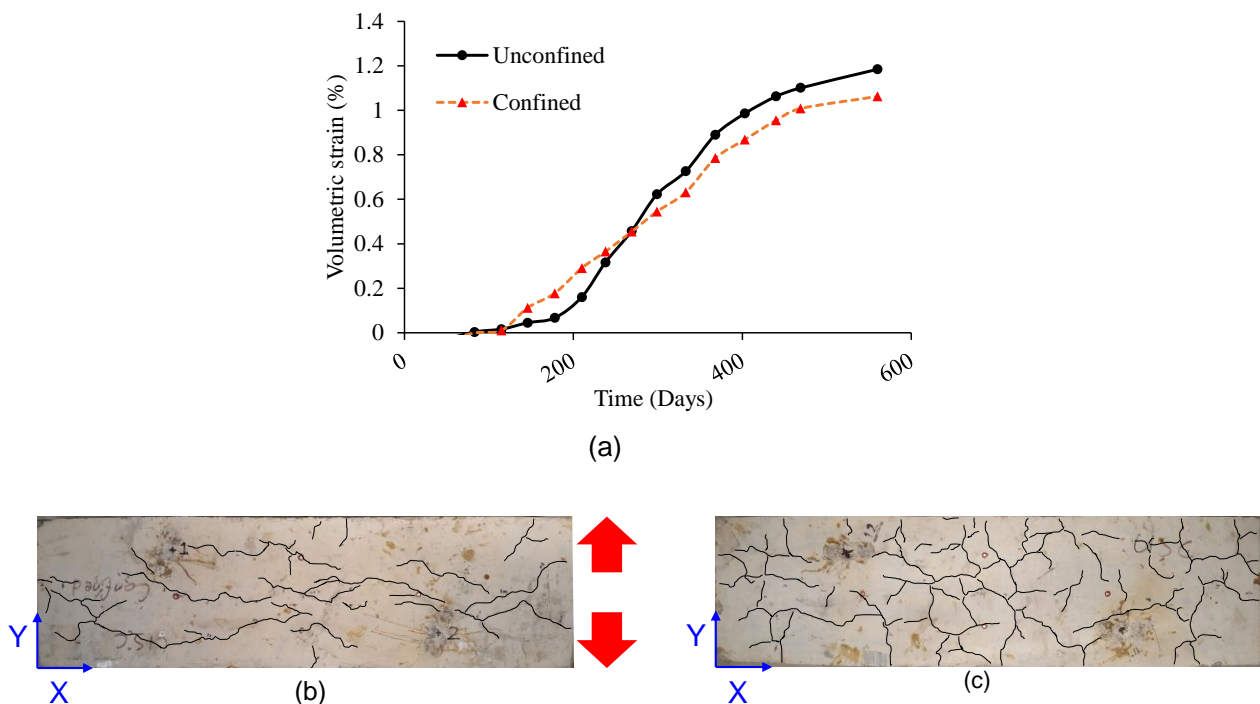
(a) Volumetric strain of concrete blocks due to accelerated ASR; (b) cracking on confined specimen; (c) cracking on unconfined specimen.
